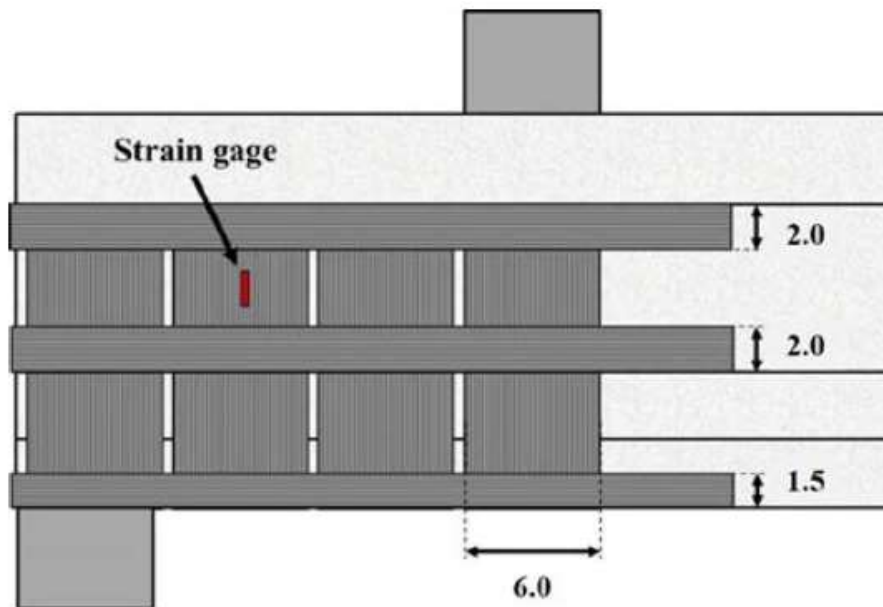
Longitudinal FRP strip anchorage detailing for half-scale specimens (from Andrawes et al., 2018).
